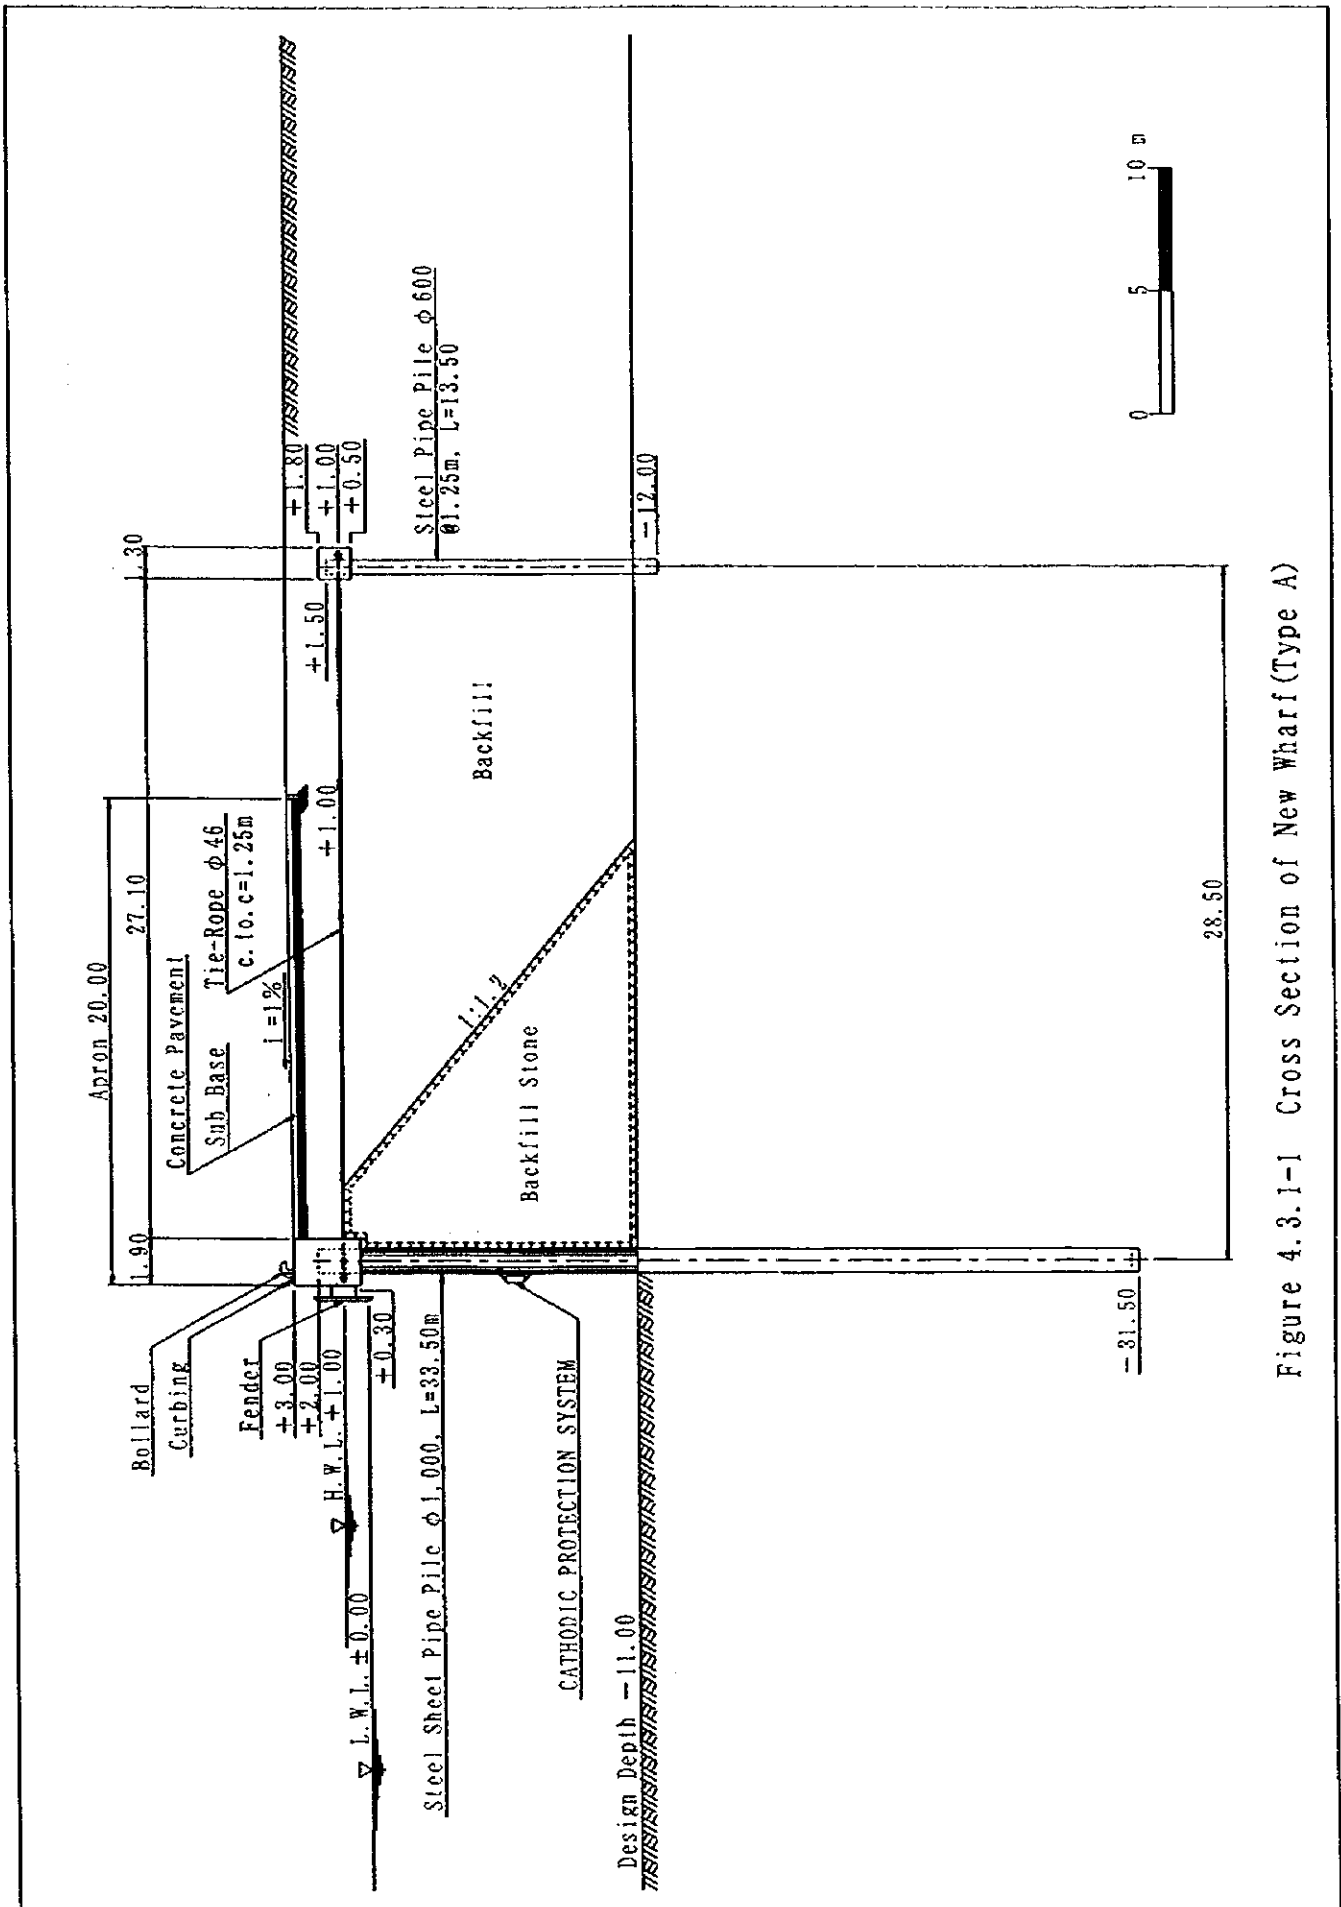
Cross Section of New Wharf (Type A)
